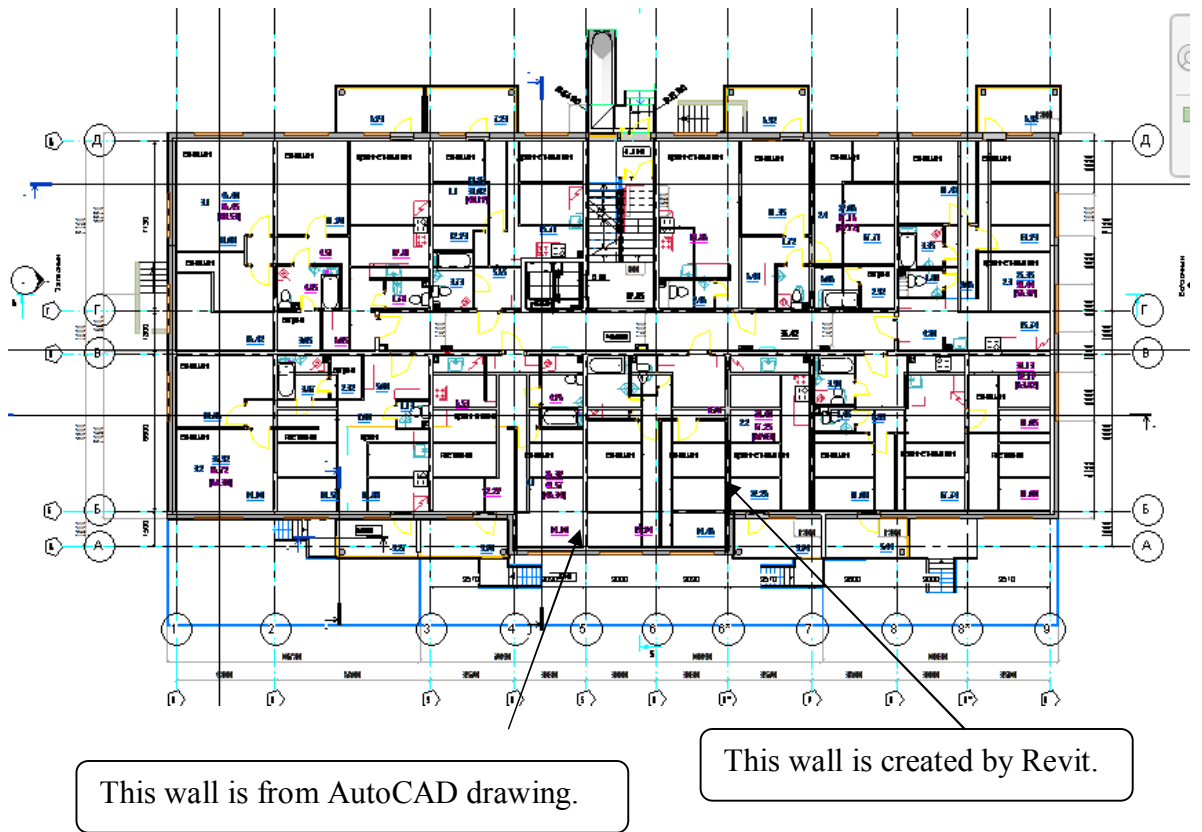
The plan of roofs from AutoCAD and Revit structure
